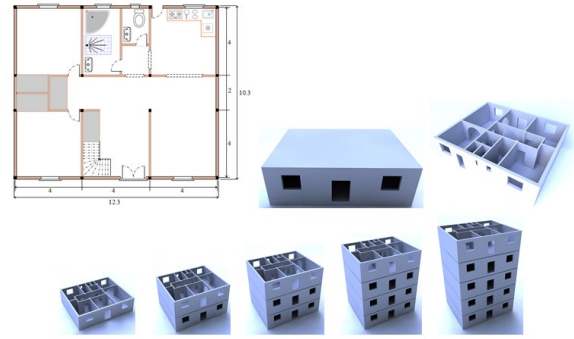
Descriptive plane, 2D and 3D Building modelling: Ground floor building and construction of single-to-four storey building
